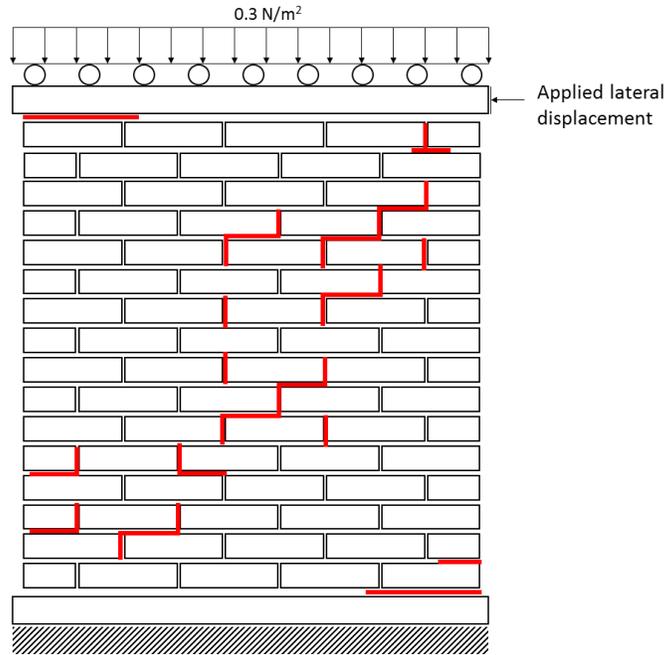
Crack patterns at 4mm of laterally applied displacement for FE model of shear wall without an opening
